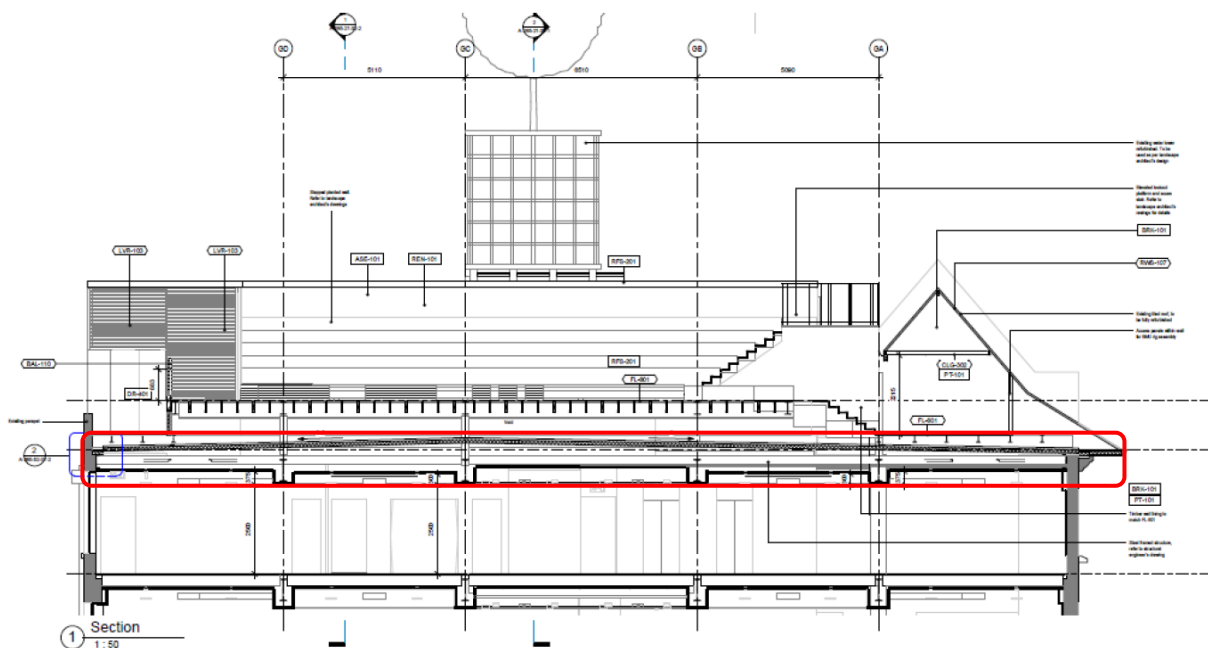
| Proposed section plan (Base source: Applicant's Heritage Impact Statement)
